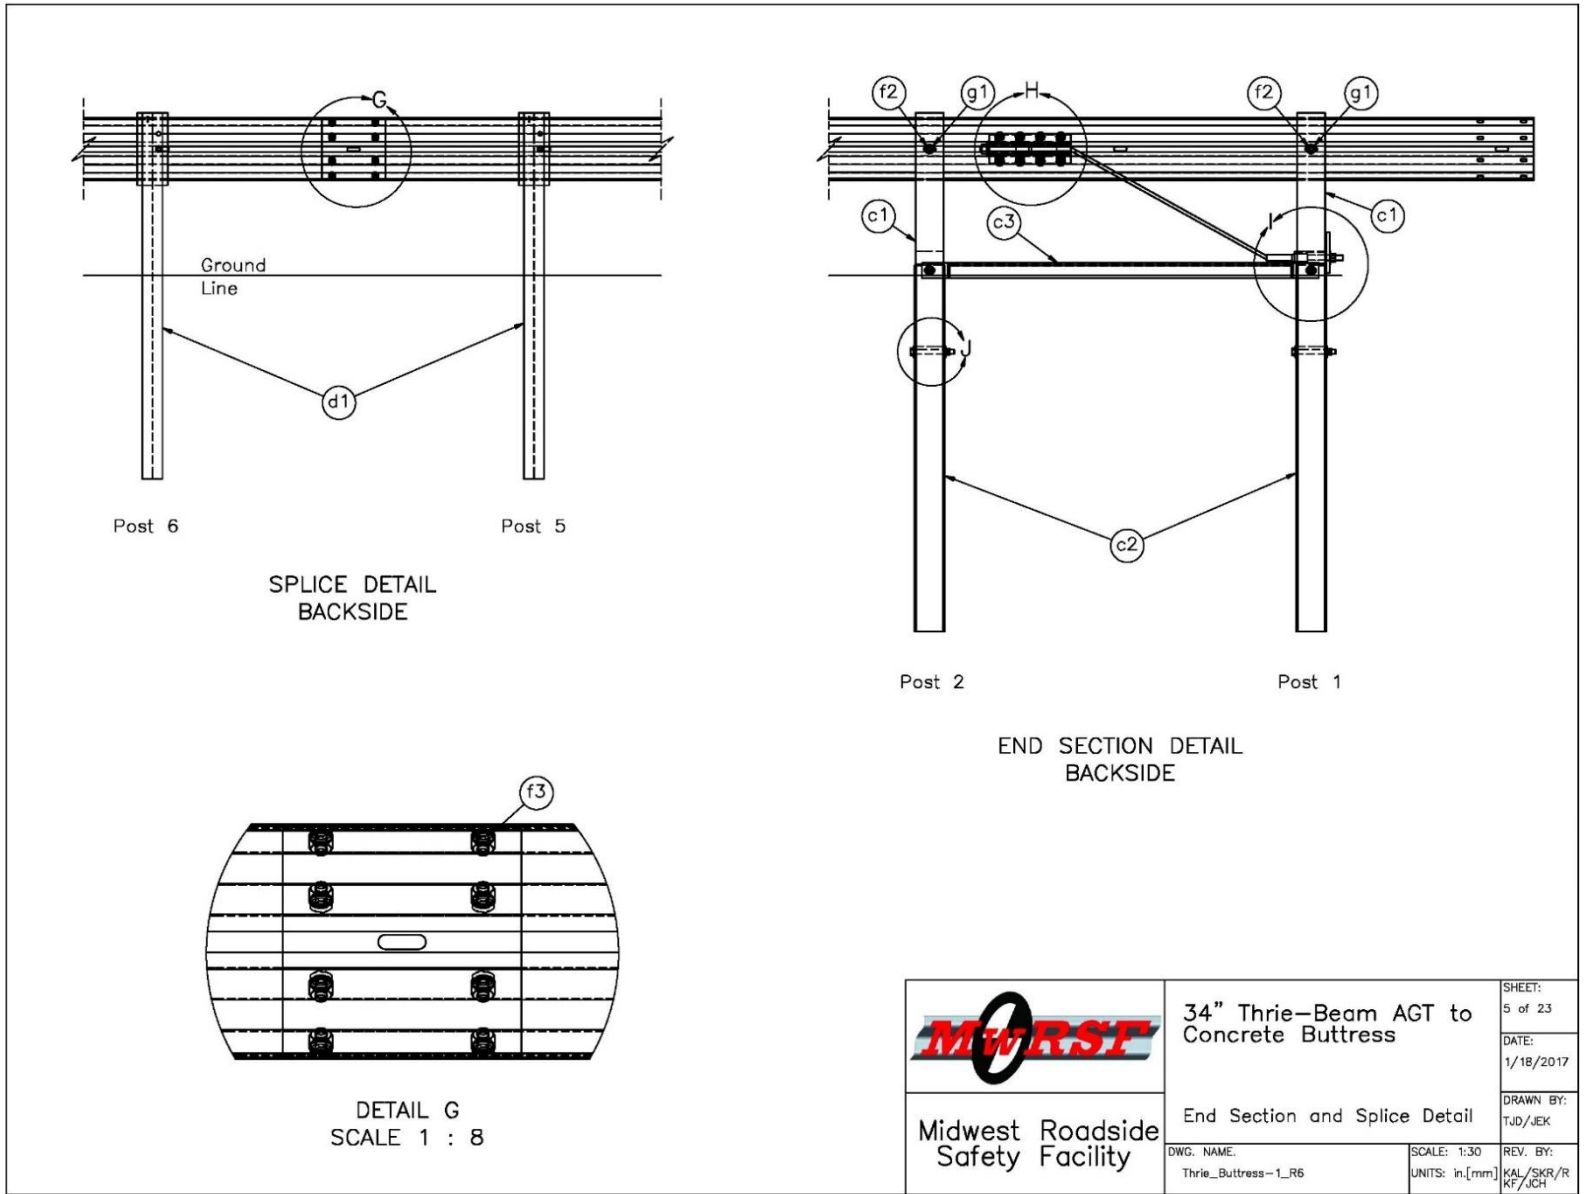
End Section and Splice Detail, Test Nos. 34AGT-1 and 34AGT-2
